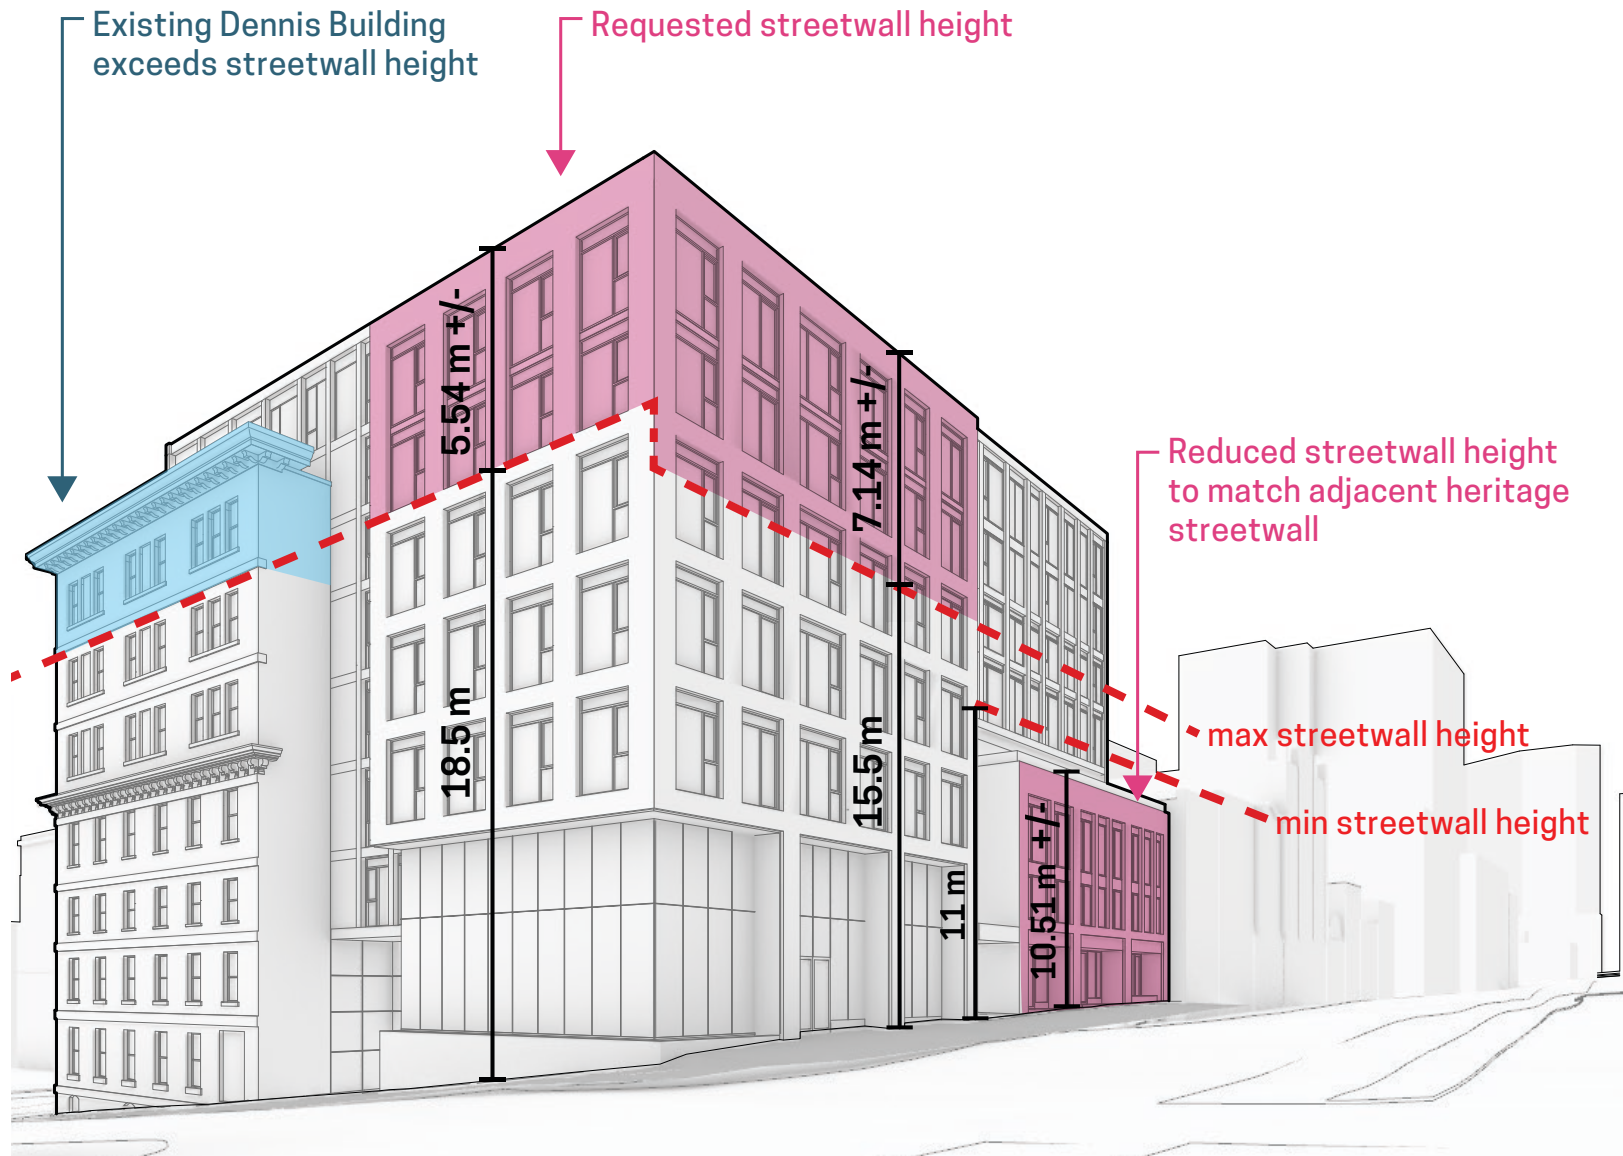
a Streetwall Height: Building massing with requested streetwall height variance. Heights are to top of slab, parapet heights and details to be determined in final design.
